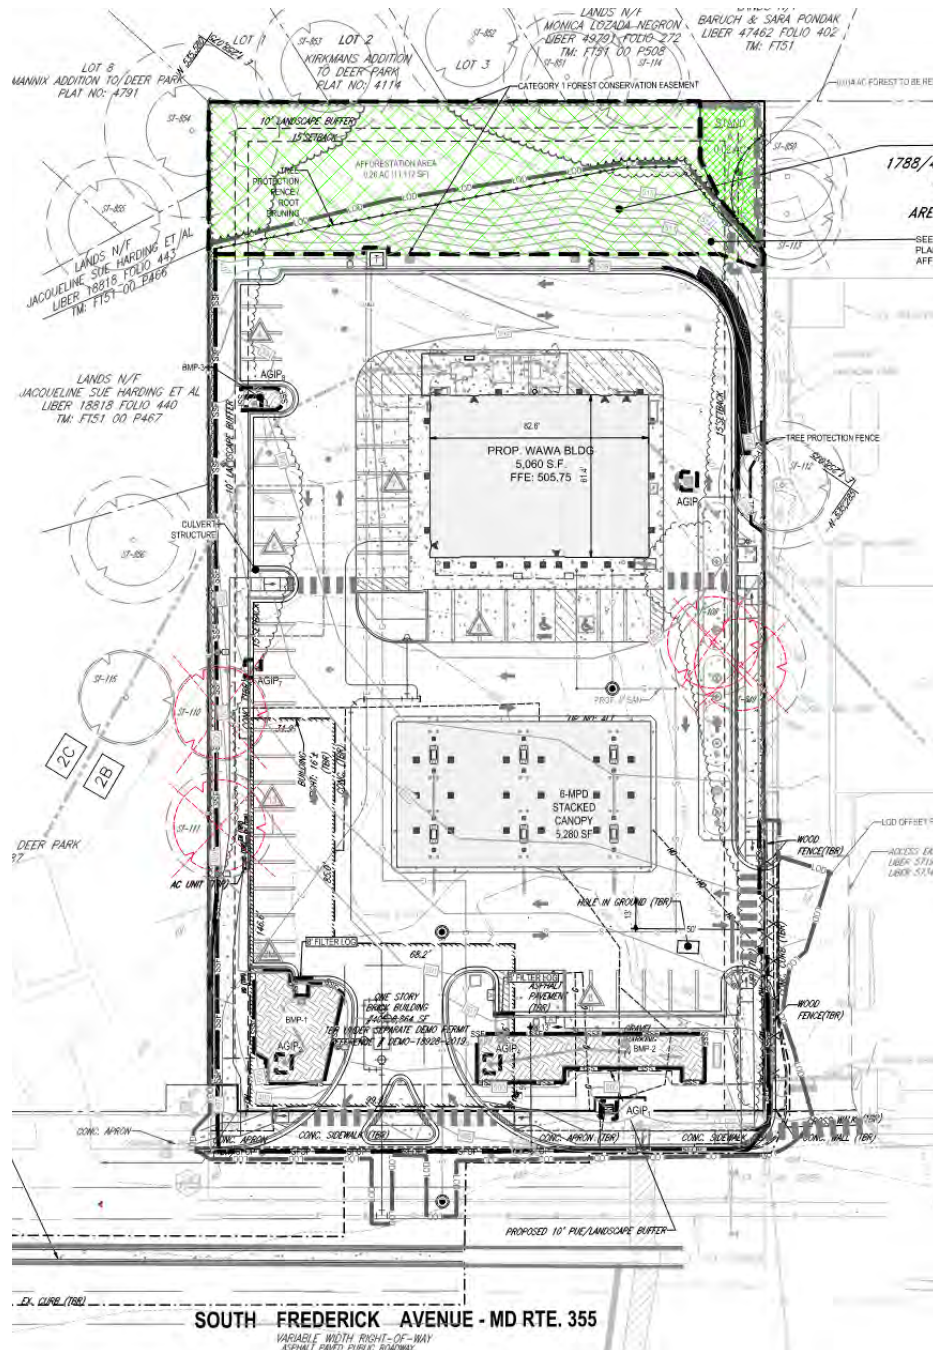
Forest Conservation Plan (Sheet 107-1)
